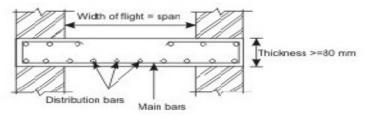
(a): Slabs supported between two stringer beams or walls
